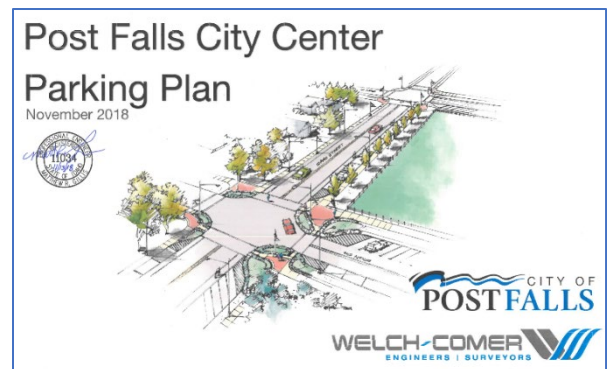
The City Center Parking Plan is a guide for parking and infrastructure development in City Center.
